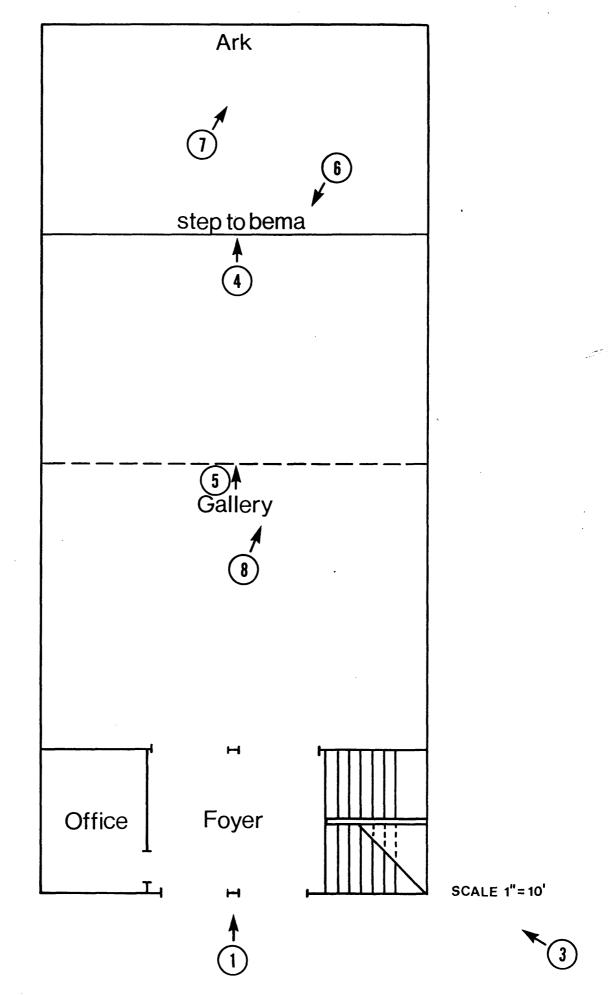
Ahavas Sholom. Schematic Floor Plan. Photo Locator Map.
